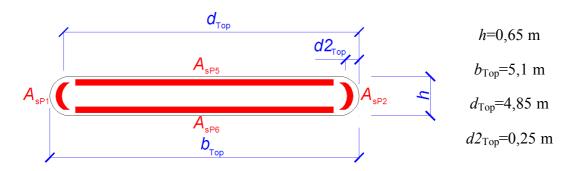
Longitudinal reinforcements at the top of the trunk
